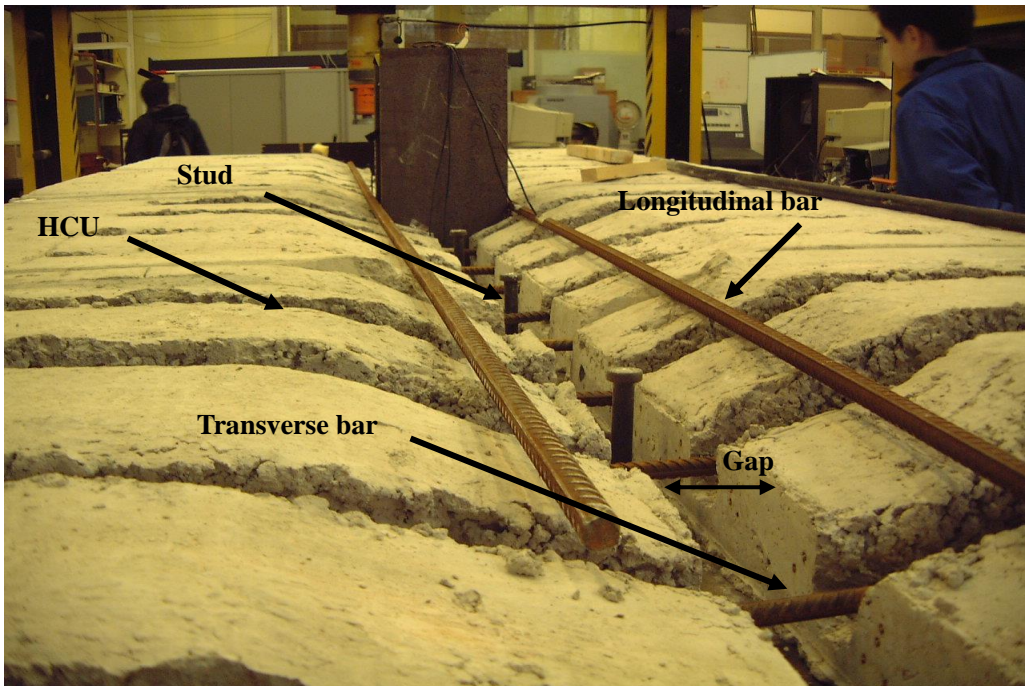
Slab, Longitudinal bar, Stud, Transverse Bar before casting
